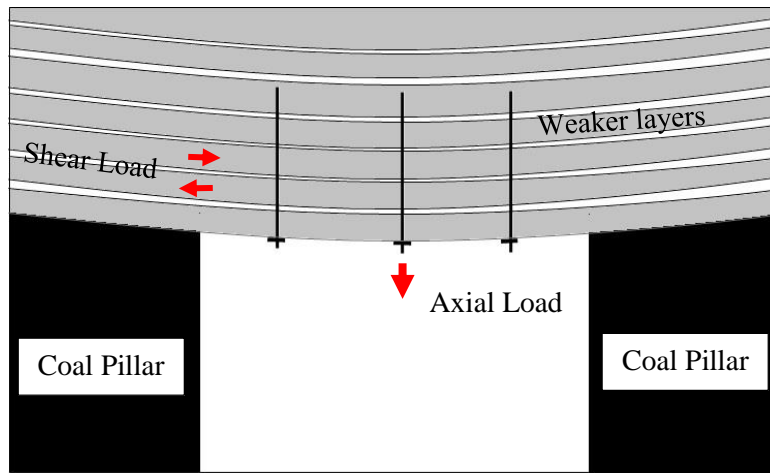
Beam building reinforcement mechanism. (Modified from, Mark (2000))
